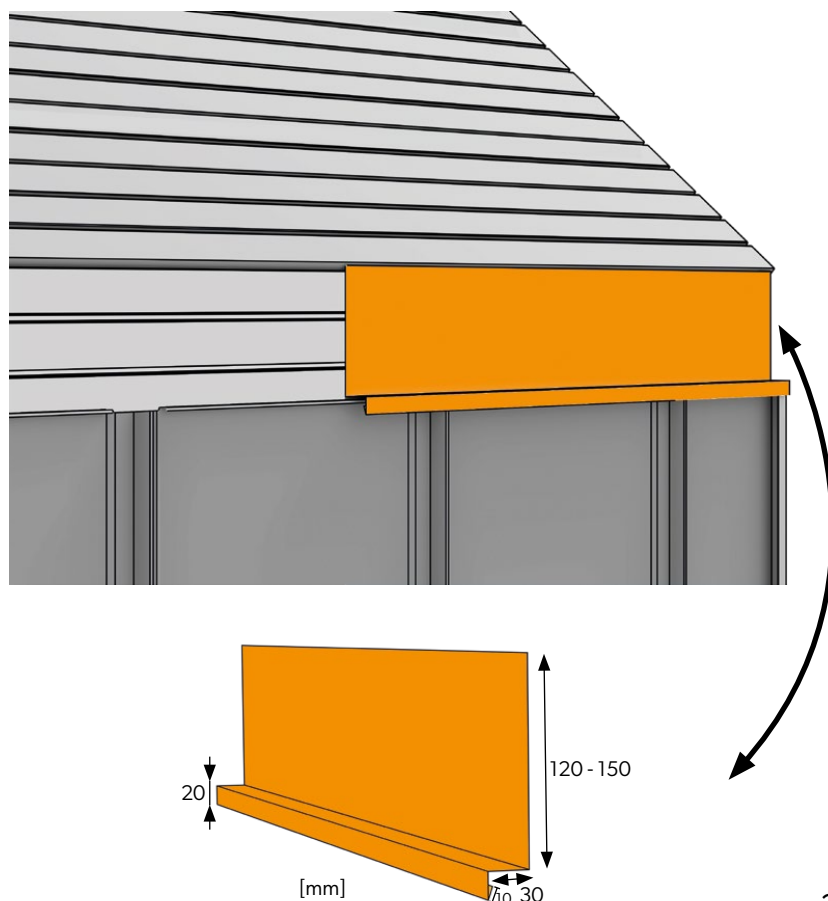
INSTALLATION OF THE FIT PANELS TO THE ELEVATION
